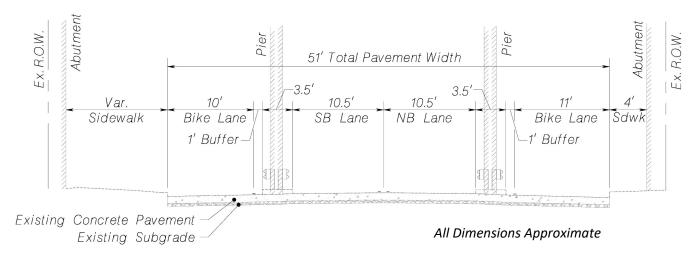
Existing Cross Section under the DRPA/PATCO Rail Bridge (N.T.S.)
